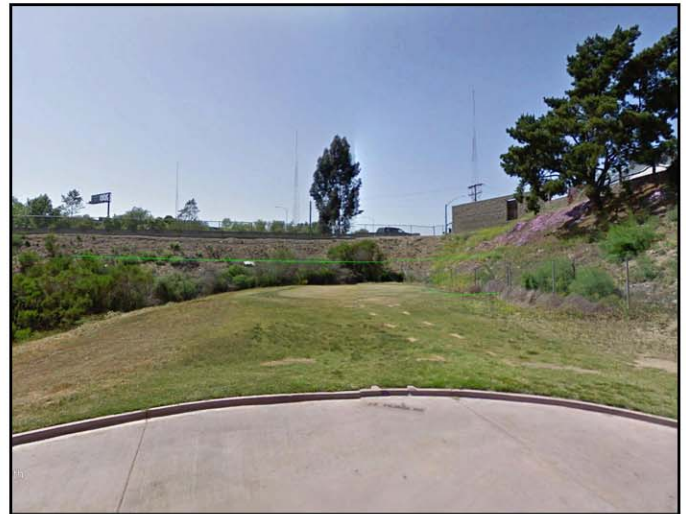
SR-52 over West View Parkway near the southwest corner of the project site.
